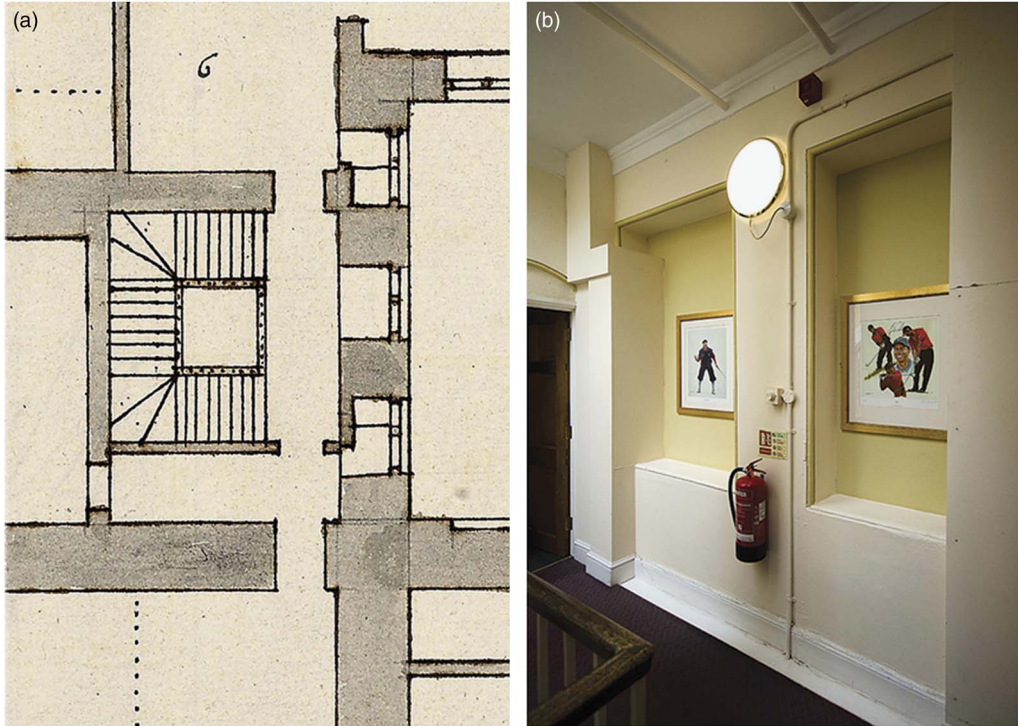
(a) Detail of first-floor plan of 1687 showing back stairs and windows to the court. *Photograph:* Bodl, MS Rawl D710, fol 133; (b) Moor Park: blocked first-floor window opening to the court, showing remnants of staff mouldings. *Photograph:* David Wrightson
